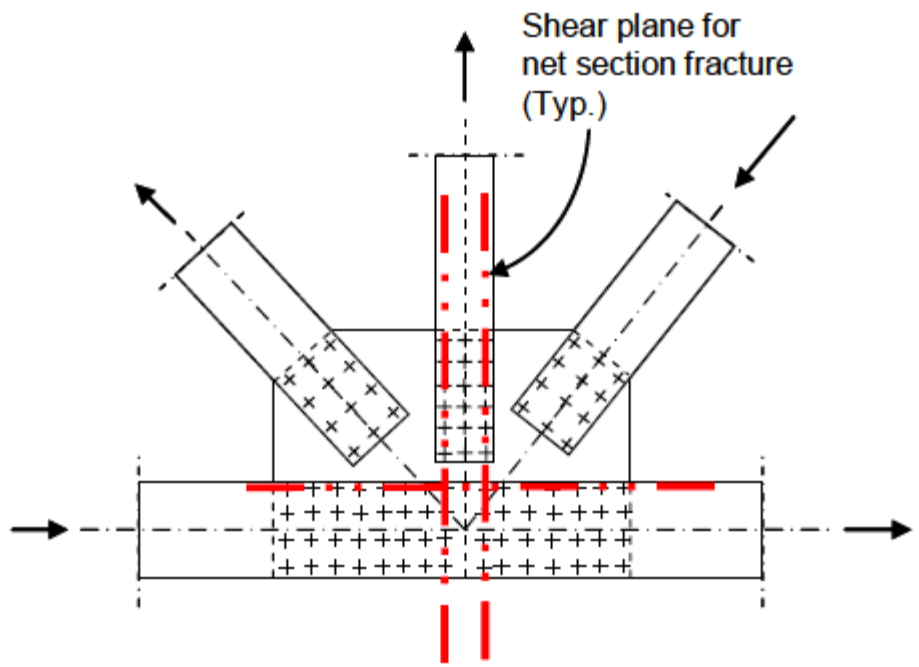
Examples of Net Section Shear Fracture Planes
